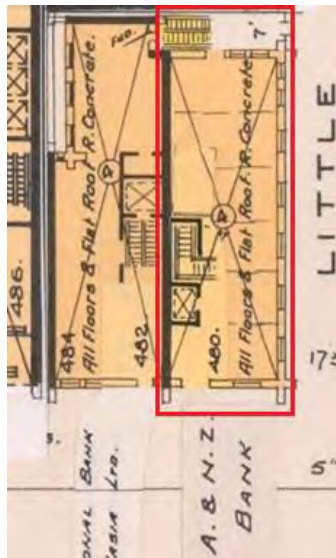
A detail from a 1948 Mahlstedt plan shows only one alteration to the building at this time; the removal of an interior stairwell. (Source: Mahlstedt Map Section 1, no 16, 1948)
